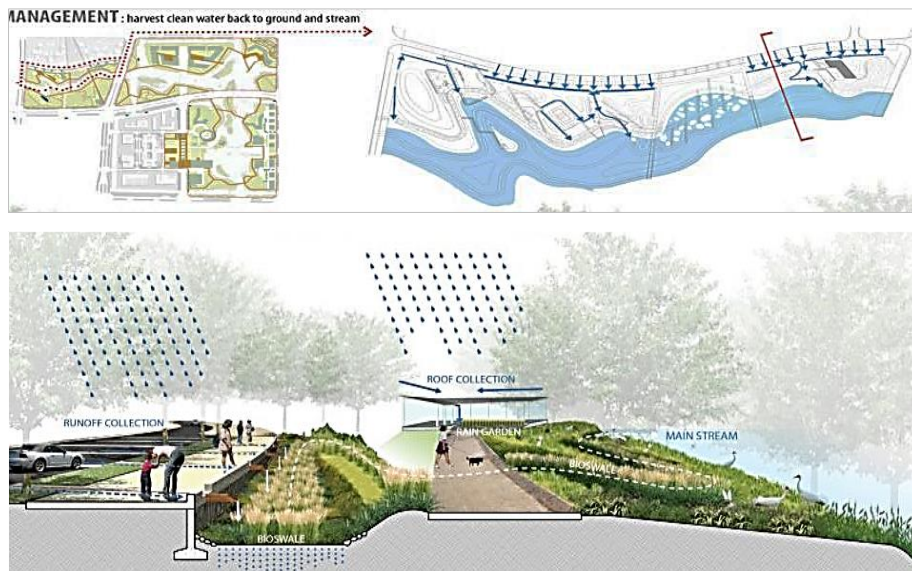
Example of landscape drainage and water storage structure of Ningbo Ecological corridor, Ningbo, China: site plan (above) and section (below).
